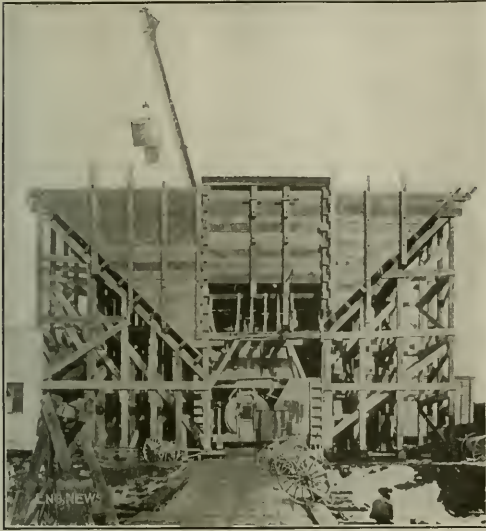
DELIVERY SIDE OF CONCRETE-MIXING PLANT, COMMONWEALTH EDISON NORTHWEST STATION
